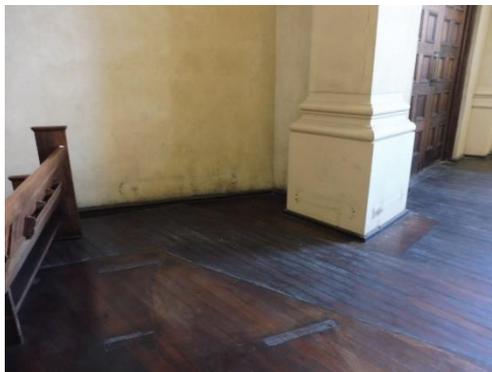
Previous fixings to Auditorium wall to be made good. Floor to be repolished, and fixing points filled.
